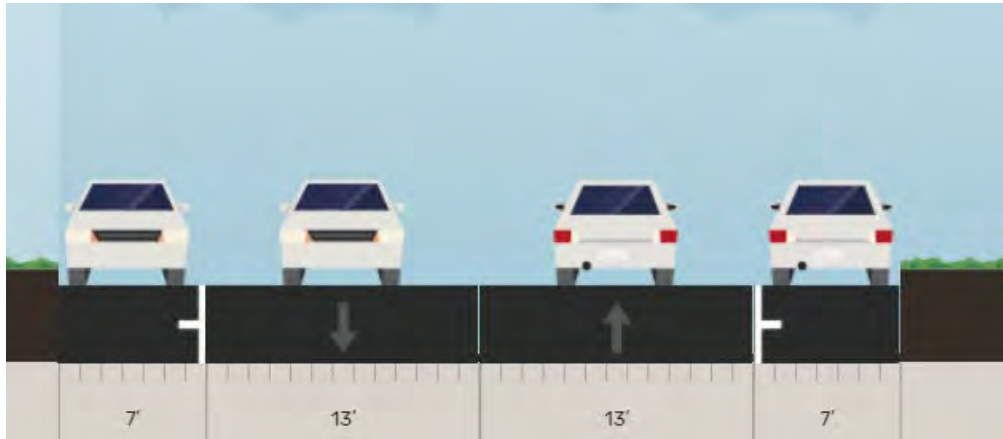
The existing Pinole Valley Road from Simas Avenue to City Limits with a width of 40 feet. On street parking is allowed along portions of this segment.
